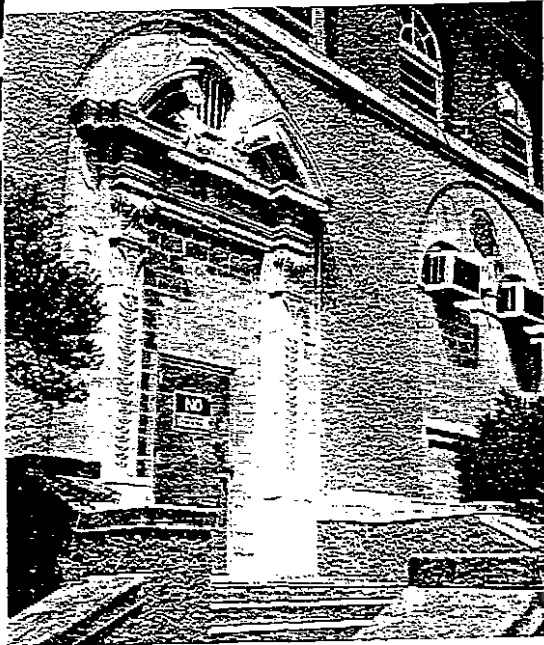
First floor openings have been filled with cinderblocks and doors, window sash and frames have been removed for safe keeping. Note the security light over the windows and the use of a security metal door with heavy duty locks. Photo: H. Ward Jandl, NPS.
